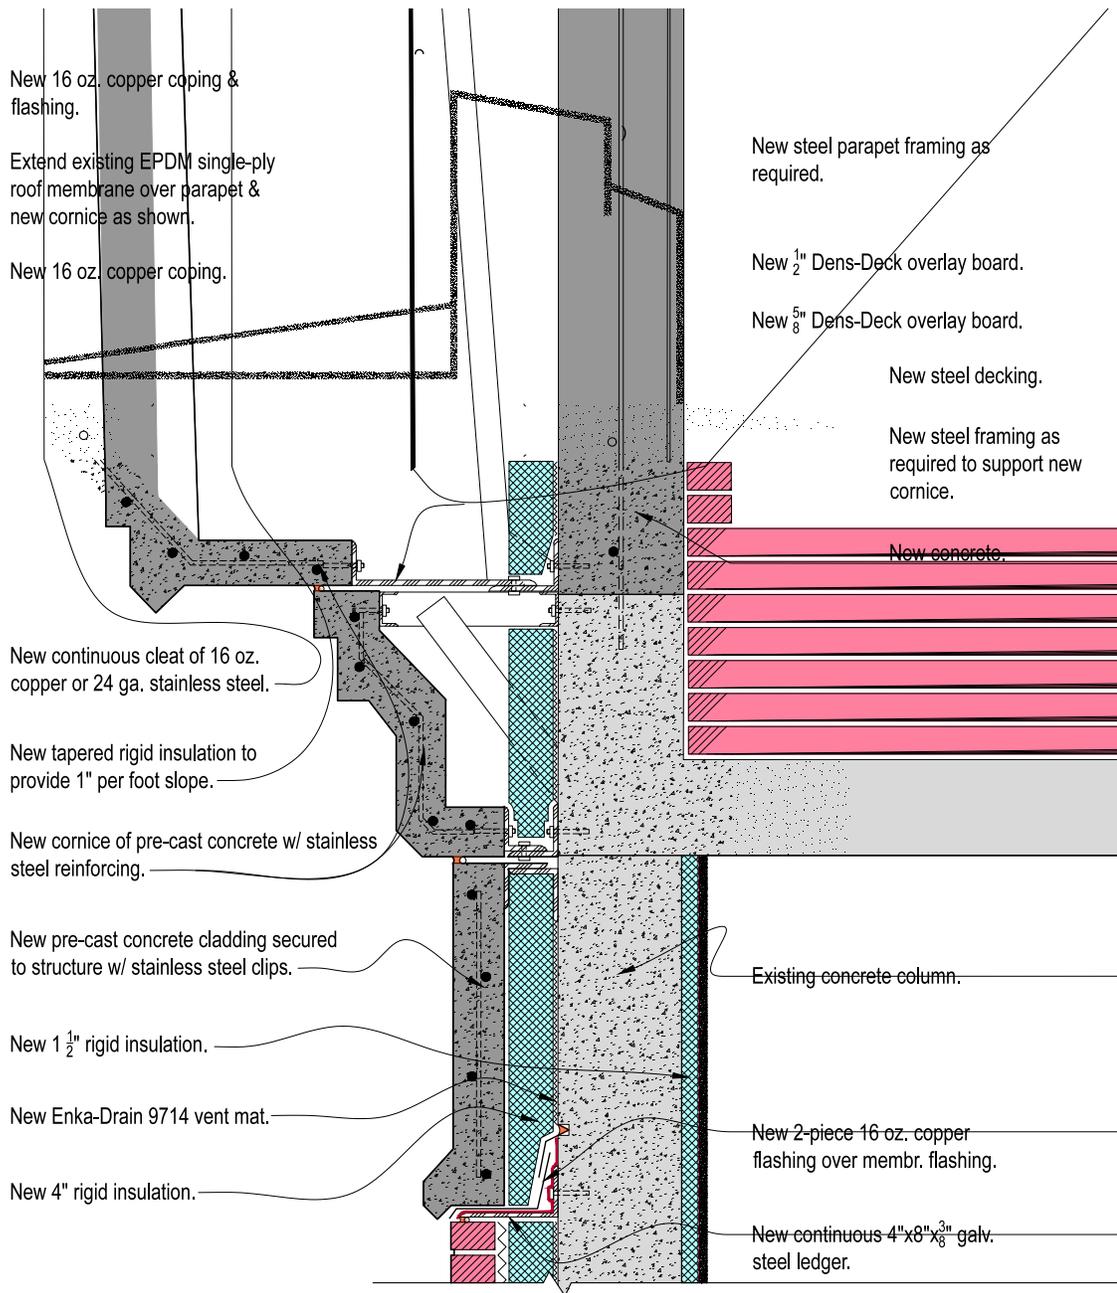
(14): Option 2 New Mas. Veneer Appr. at Roof-Level Cornice-Parapet
